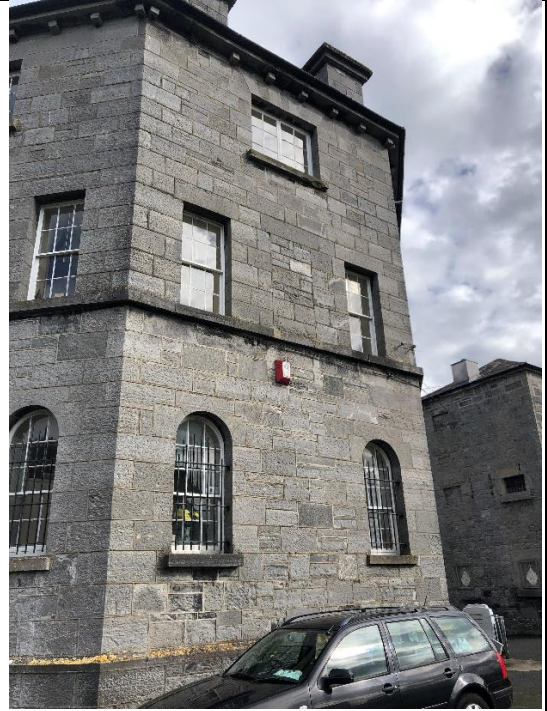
External view of west elevation showing blocked-up gantry opening at first floor level.
